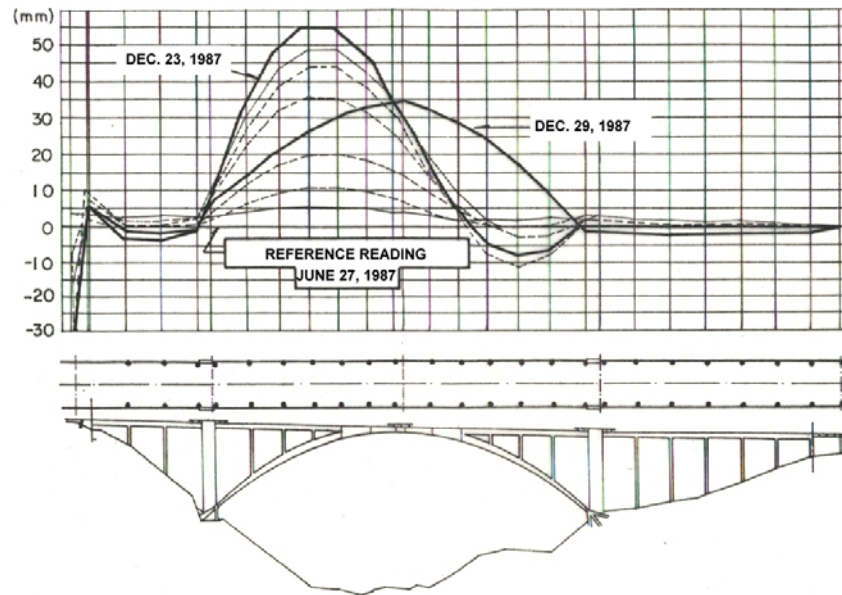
Deck deformation before and after joint cuttings in Caracas (left) and La Guaira (right) abutments.
